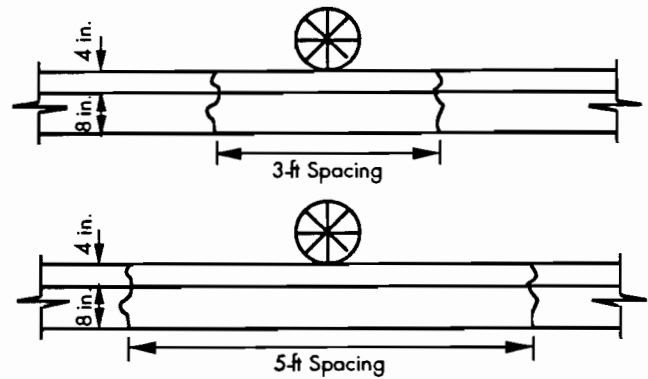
Wheel load position between cracks for typical crack spacings in BCO
